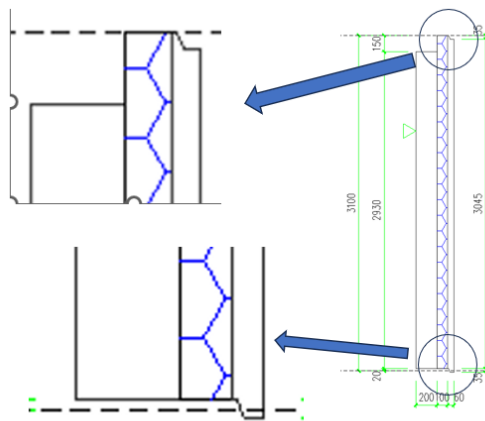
YJK's built-in prefabricated building design software automatically sets up tongue-and-groove joints for prefabricated exterior walls
